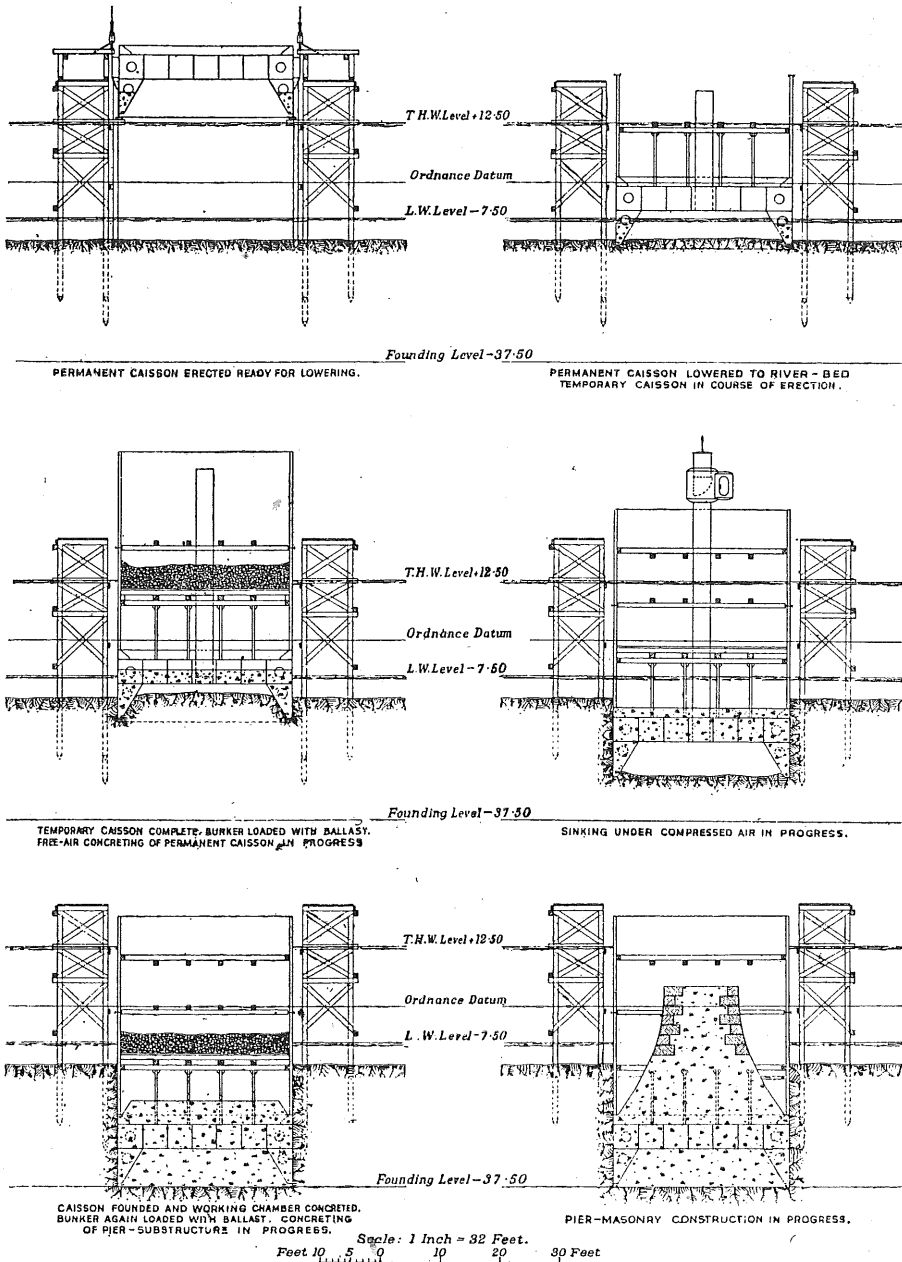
STAGES IN THE SINKING OF CAISSON FOR RIVER PIER OF LAMBETH BRIDGE, LONDON.
